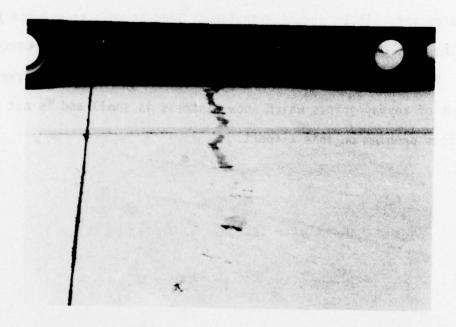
Reflective Crack Through Concrete Slab on an Econocrete Subbase, Shreveport. Crack was Repaired with Epoxy.
